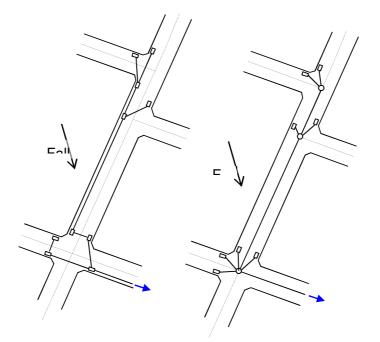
Pipe System Layouts in New South Wales and Queensland
